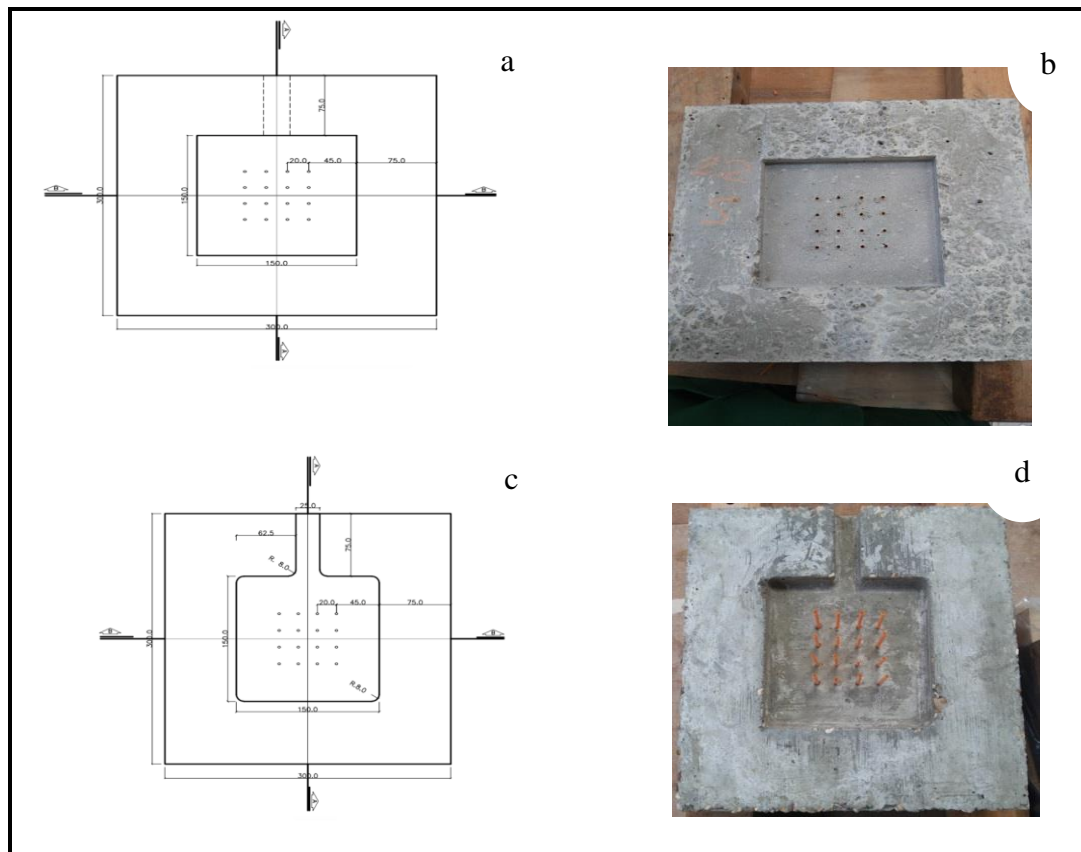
(a) Top plane viewing of concrete slab, (b) Top of manufactured slab (c) Down plane viewing of concrete slab, (d) Down of manufactured slab
